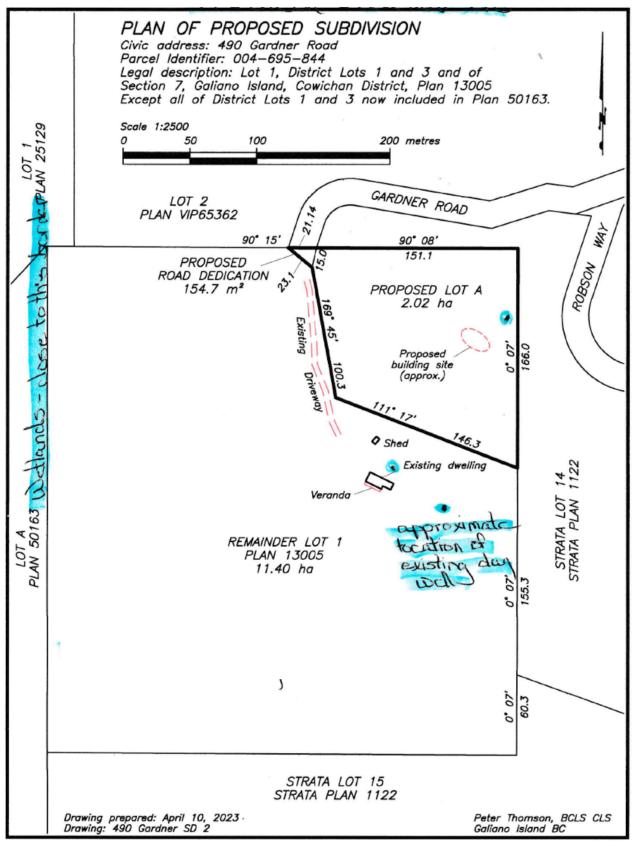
Draft plan of proposed subdivision. Adapted from Thomson (2023).
